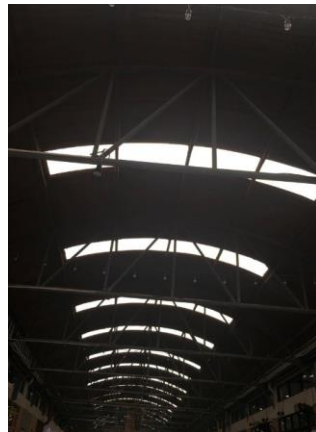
Steel Trusses and Decorative Concrete Kept in the Warehouses
